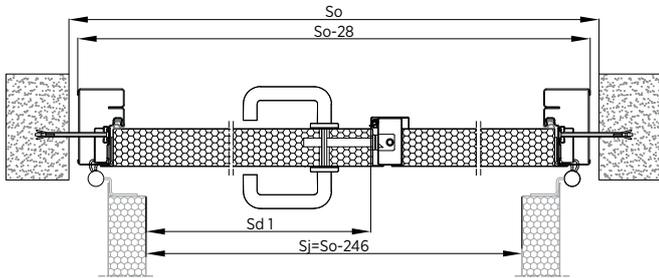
Installation of the double-leaf door to a masonry wall - internal frame with a thermal break - horizontal cross-section
